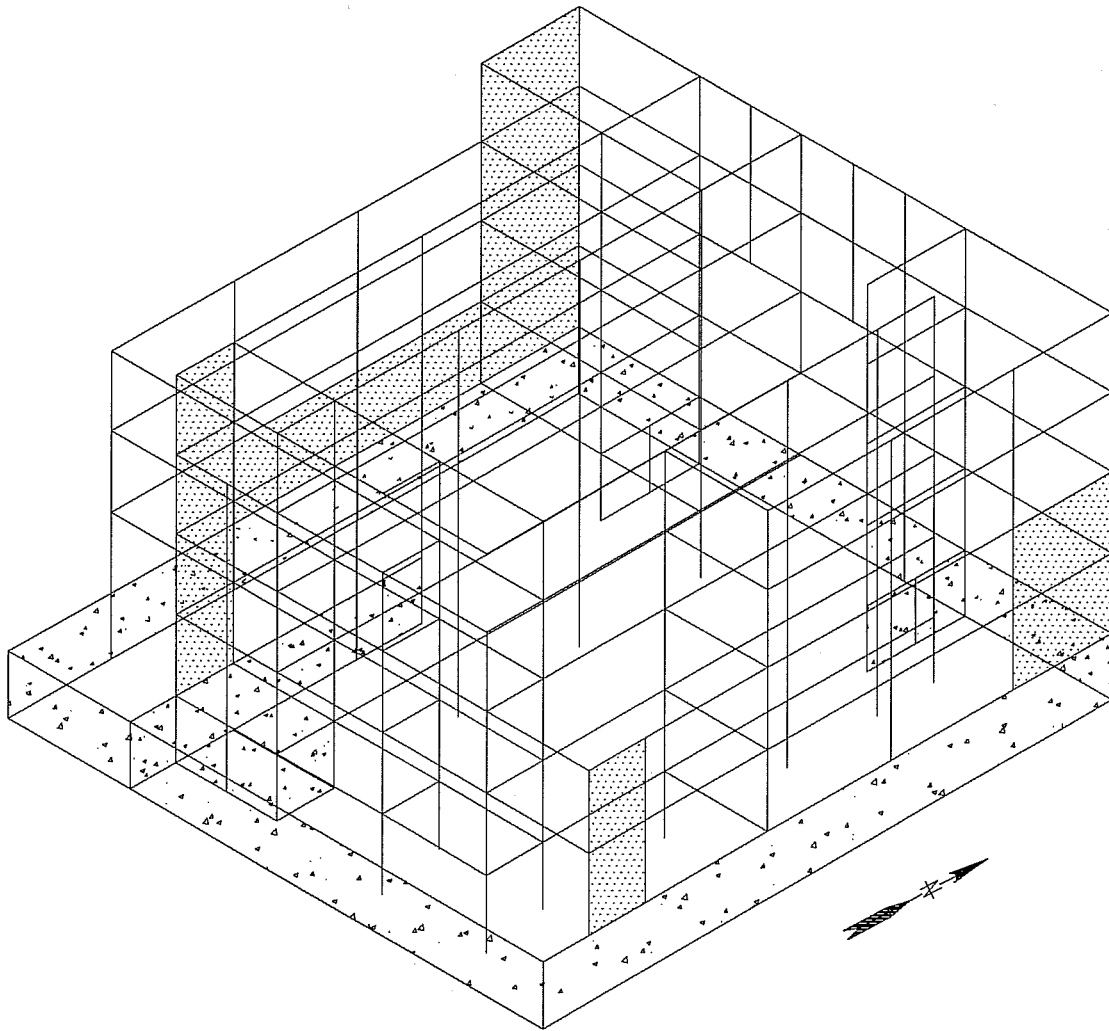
Peninsula Office Building - Three-Dimensional View of the Building Model Showing Locations of Brick Veneer Panels in the East and West Exterior Walls.
